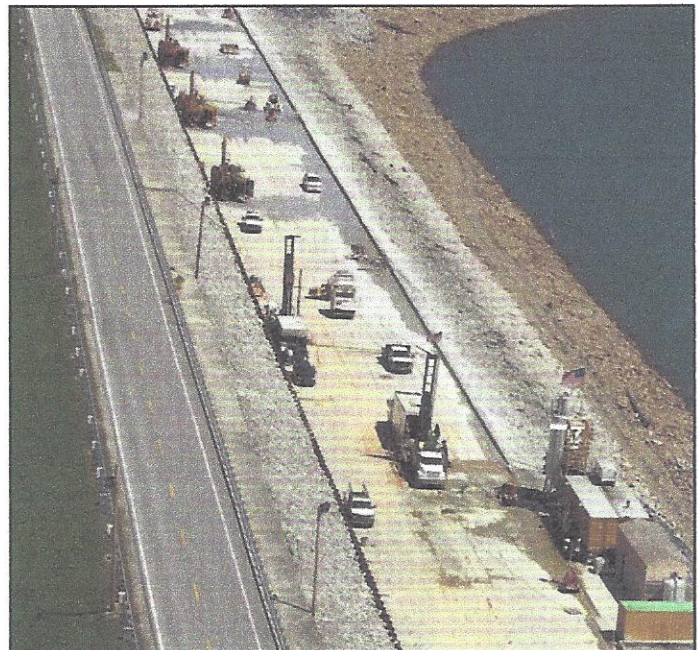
Aerial view of concrete work platform for the Phase 3 works
